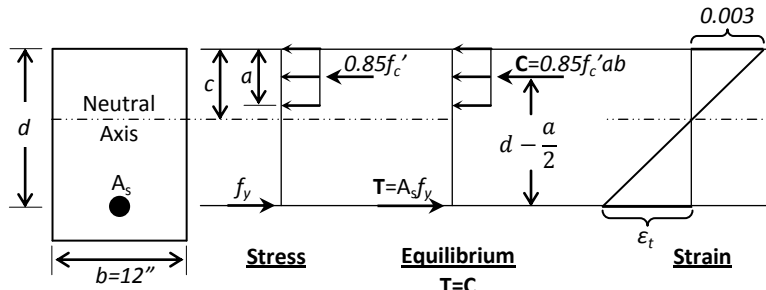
Stress-Strain Diagram of Typical RC Section
